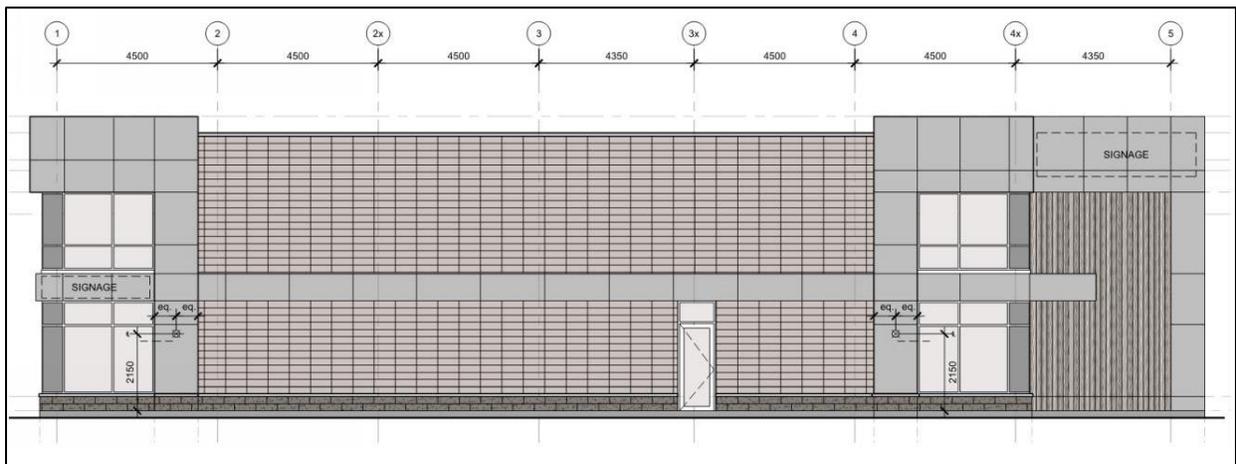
Conceptual multi-unit retail building elevation – View looking east (shown as West Elevation on 4 – A300 dated January 16, 2019).
